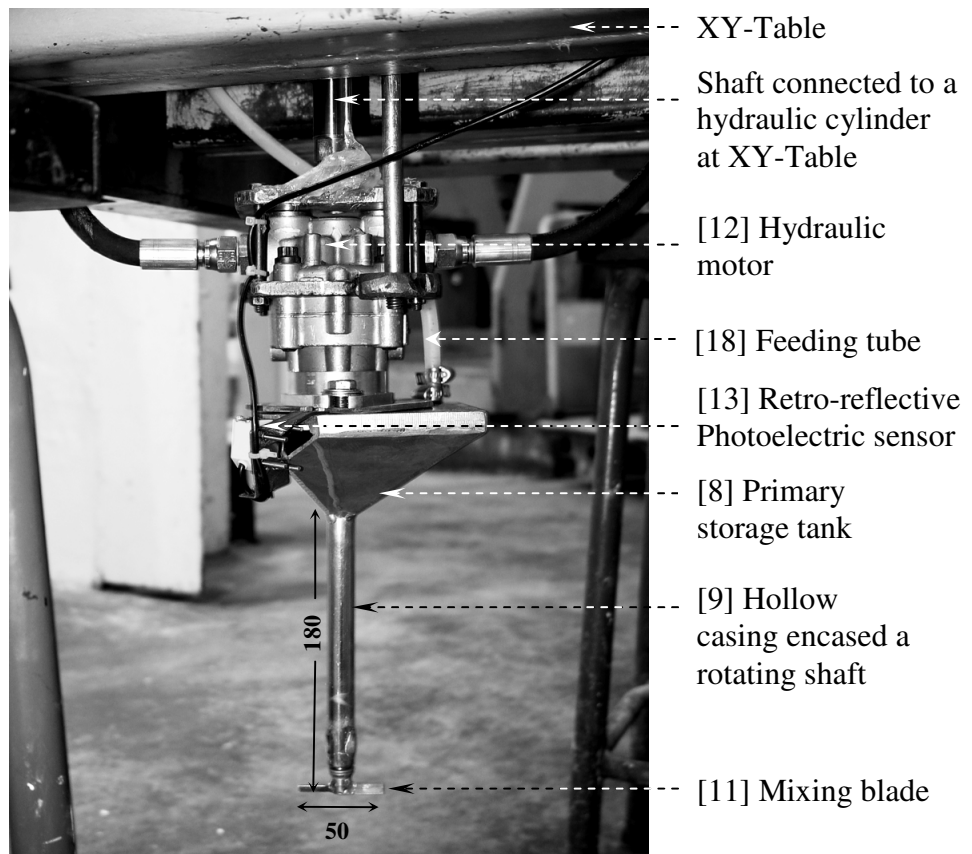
DM installer A mounted on the XY-table (all dimension in mm).
